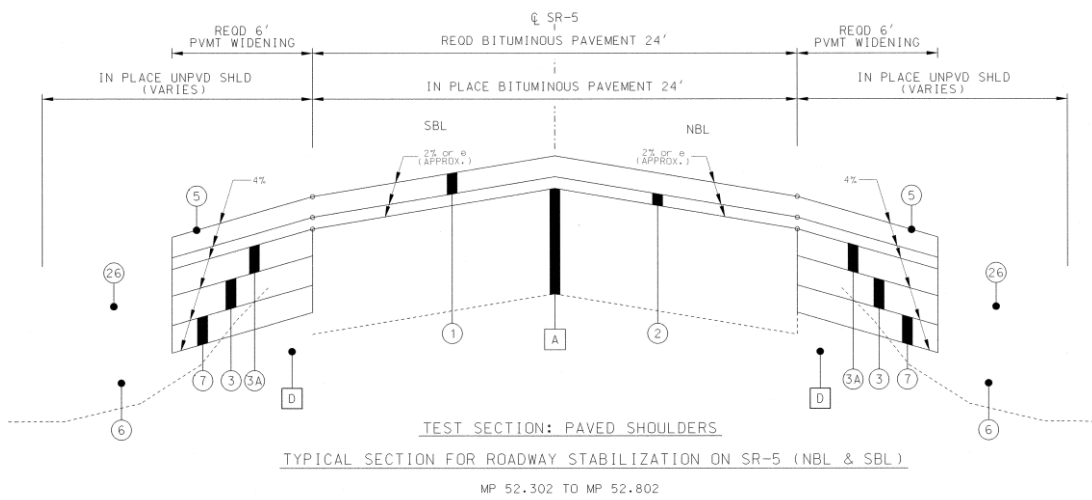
Paved Shoulder Cross Section (ALDOT 2015)
